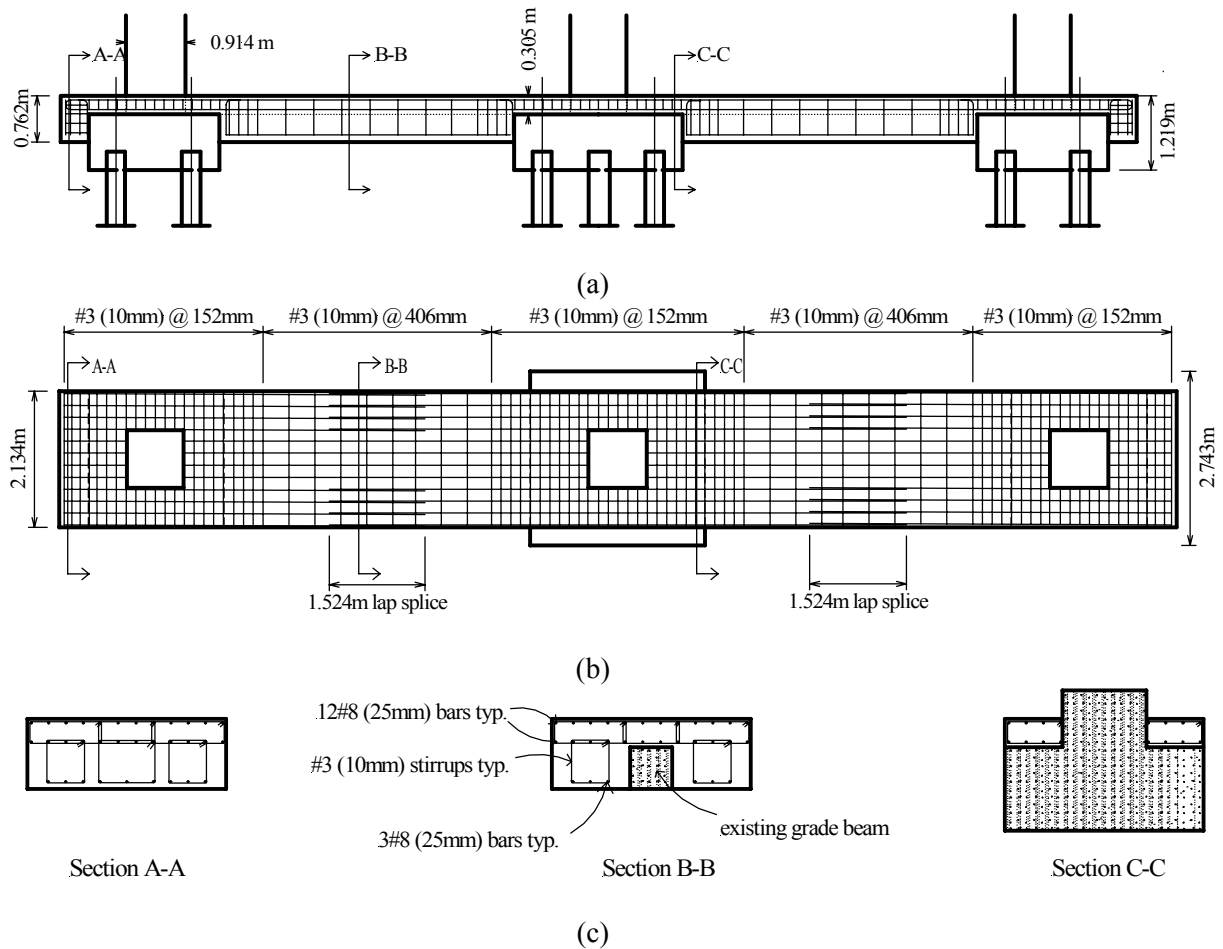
Grade beam reinforcement details: (a) elevation view, (b) plan view, and (c) Section A-A knee joint, Section B-B span between pile caps, and Section C-C overlay on existing pile caps
